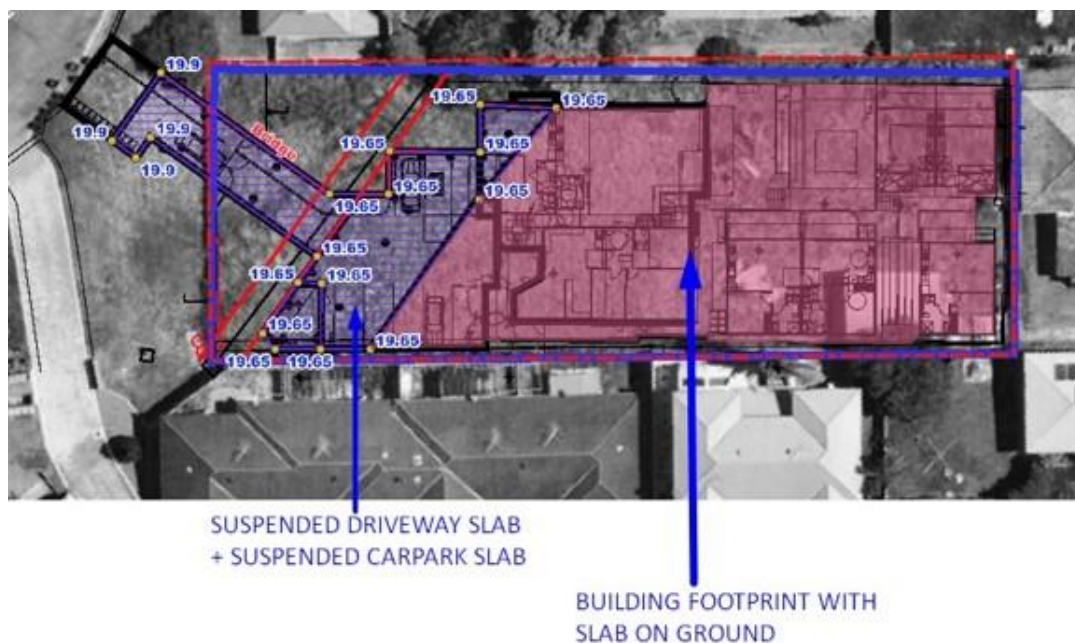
Suspended driveway slab modelled with Layered Flow Constriction technique
